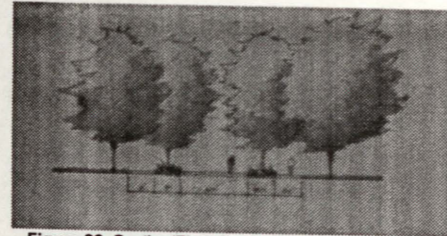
Section/Elevation of Planters at the Border of the Sidewalks and the Main Path
